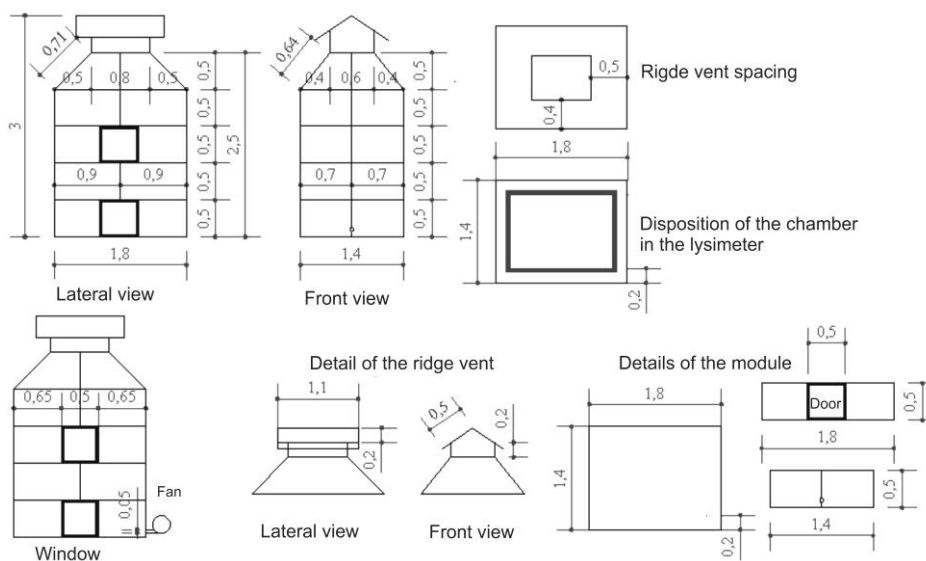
Dimensions (m) and structural details of the open-top chambers developed for the work, together with the modules and the ridge vent.
